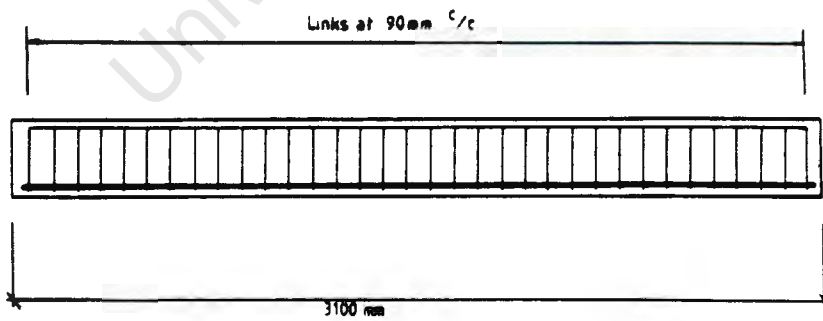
Stirrup Spacing for the Simply Supported Beams.
